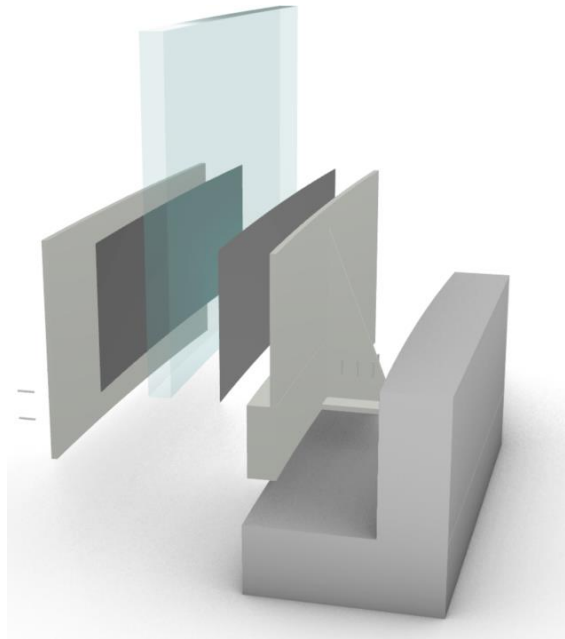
3D exploded view of the connection to the ground floor (own figure)
